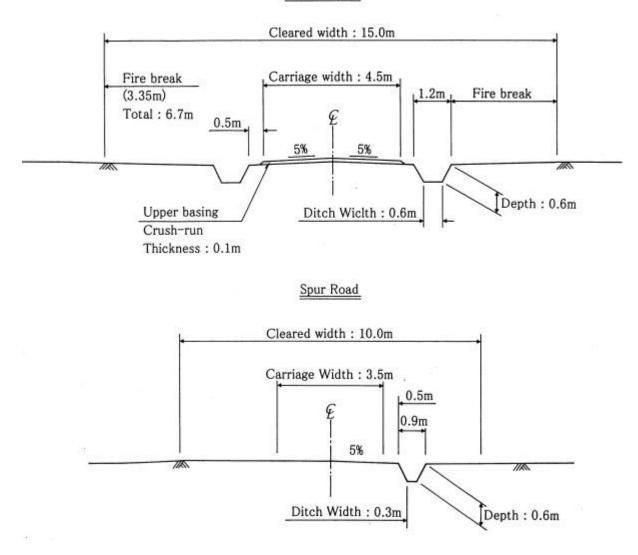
Standard Cross-Section of Forest Roads-Firebreaks
